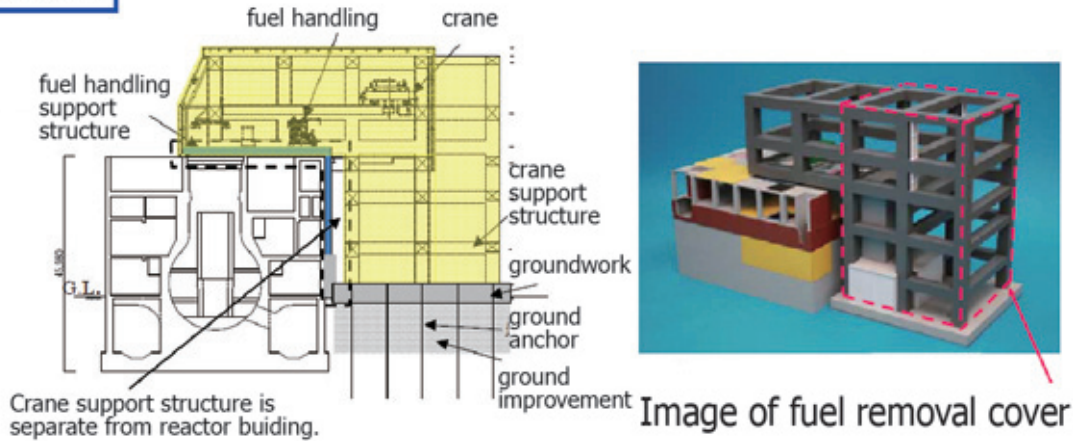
; Fukushima Daiichi (F1) Unit 4 Fuel Removal Cover
